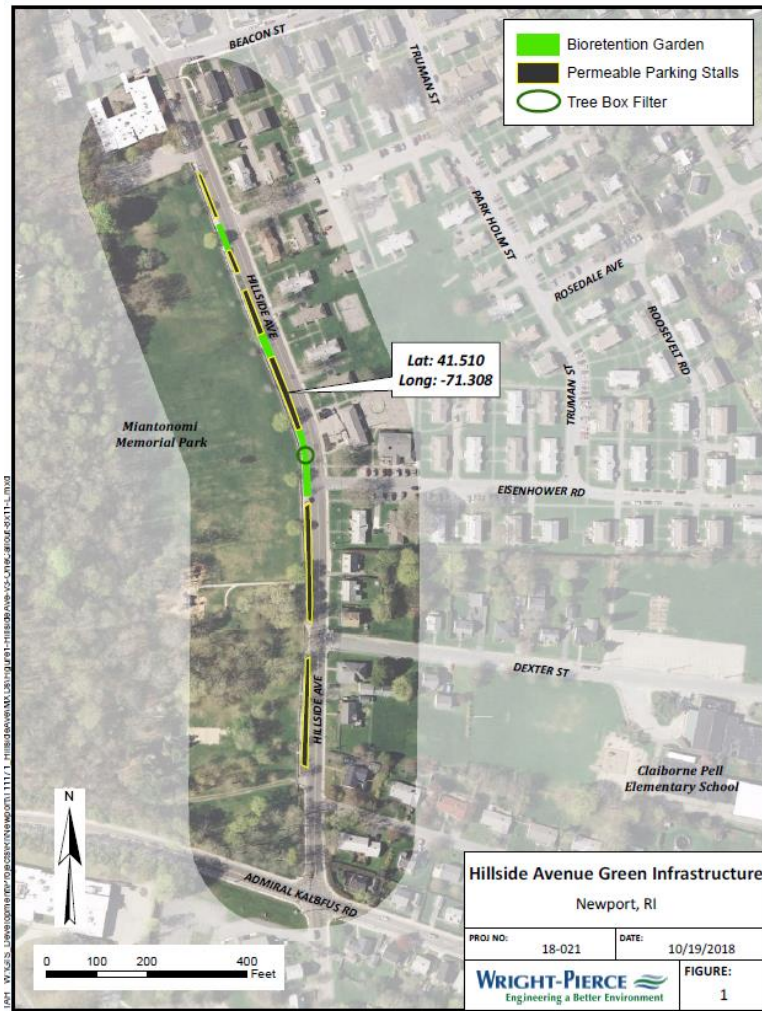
Hillside Avenue Green Infrastructure Project Plan
